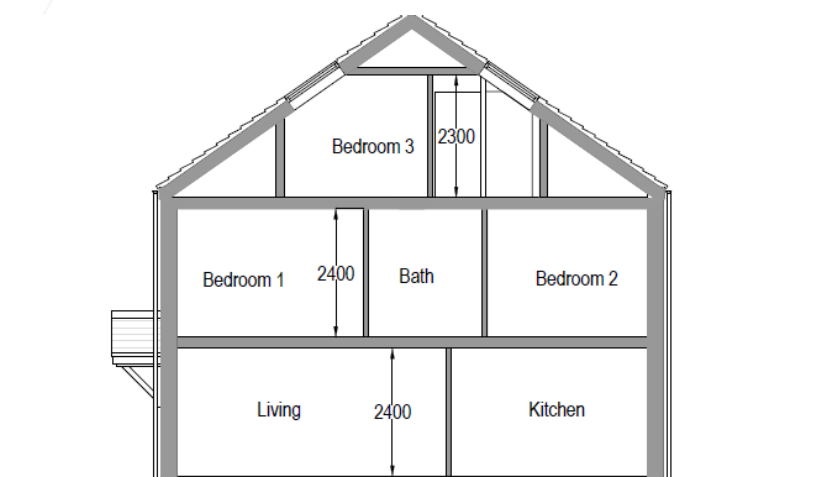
Extract from Piercy Design drawing number 2022-01/P01.
